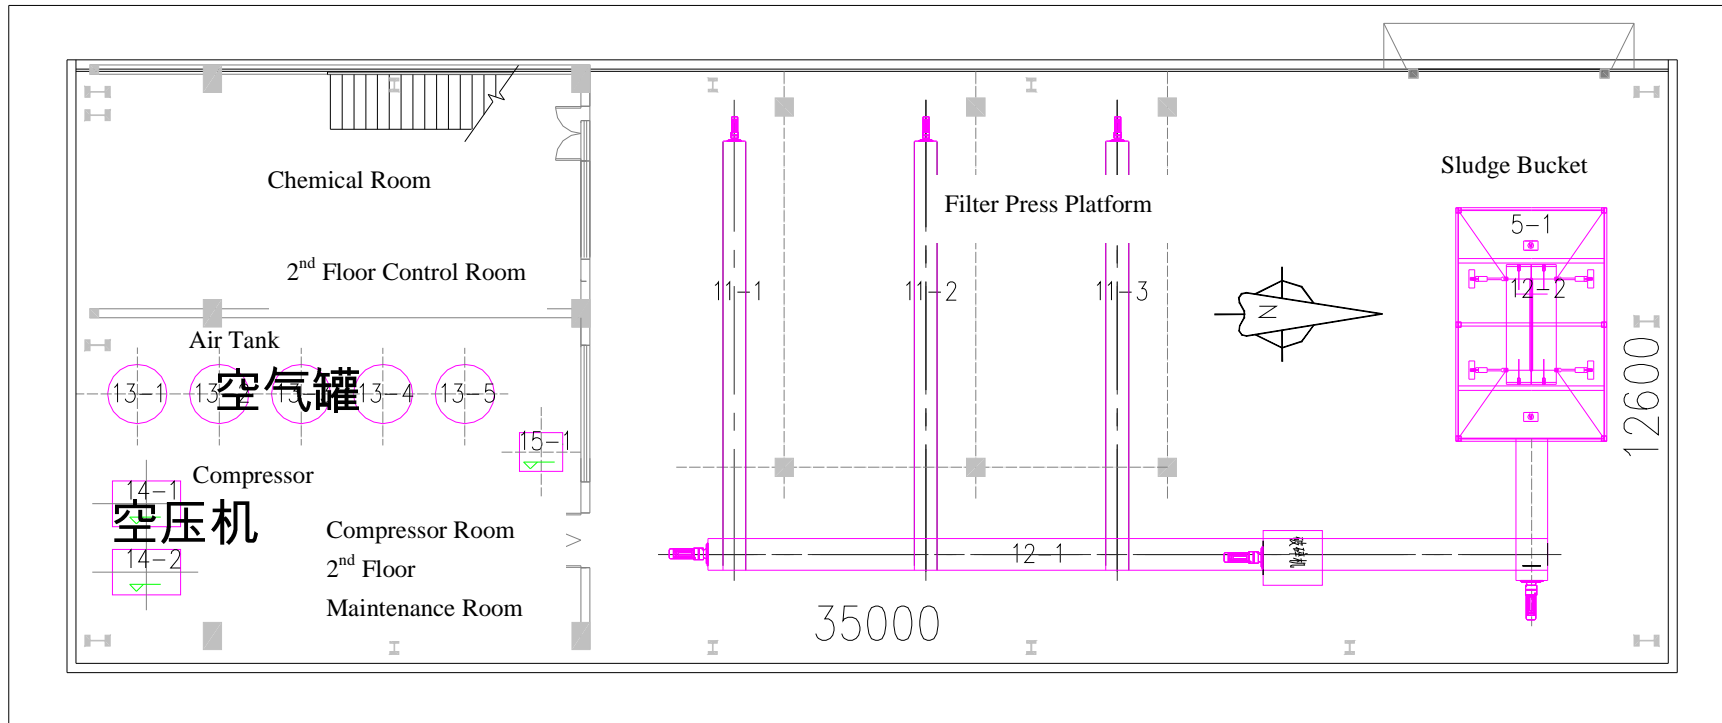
Layout of Shagang WWTP Advanced Sludge Dewatering Workshop
